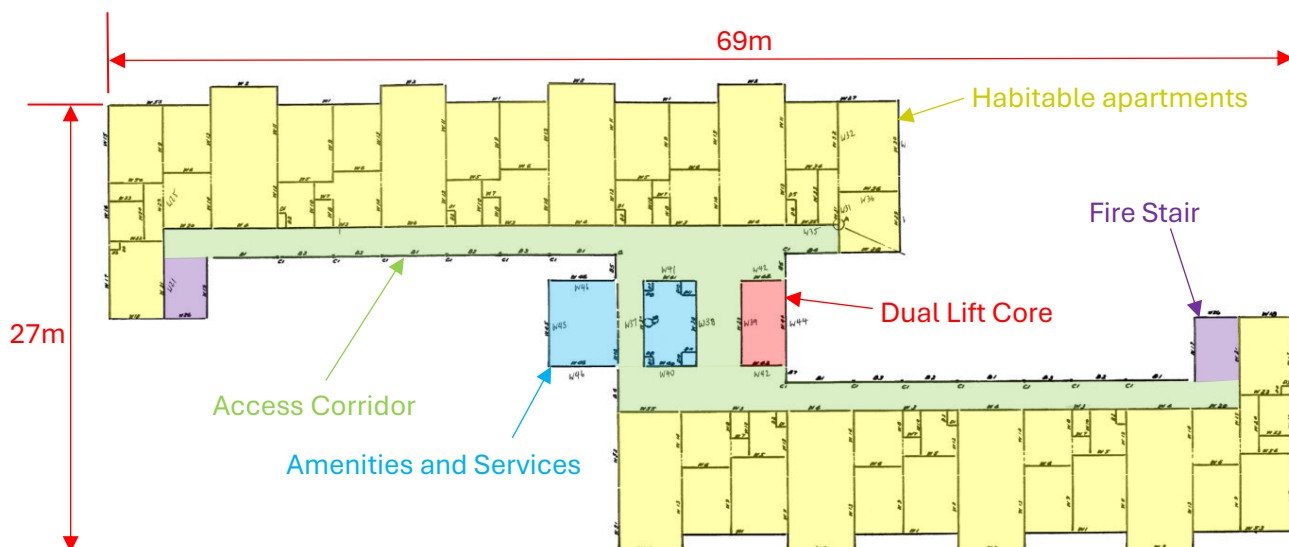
Plan view, typical floor, of the S-Type Housing Commission Building.
